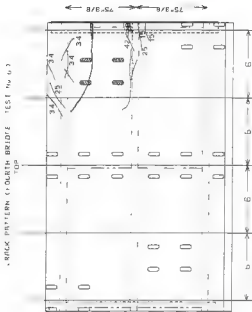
Top Cracking Pattern (Fourth Bridge - Test No 6)
